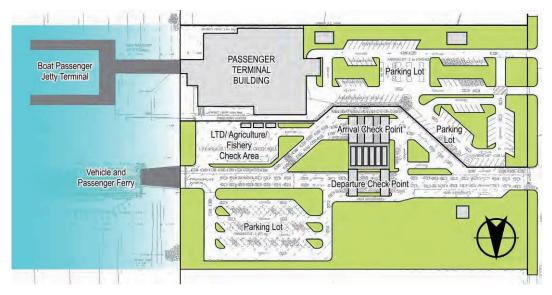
Layout Plan of Serasa Ferry Terminal
